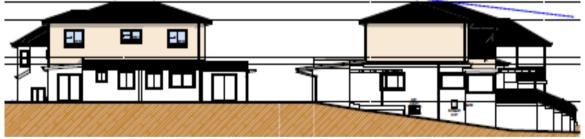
Southwest (rear) and Southeast (side) elevations (source - Extend A Home Constructions)
